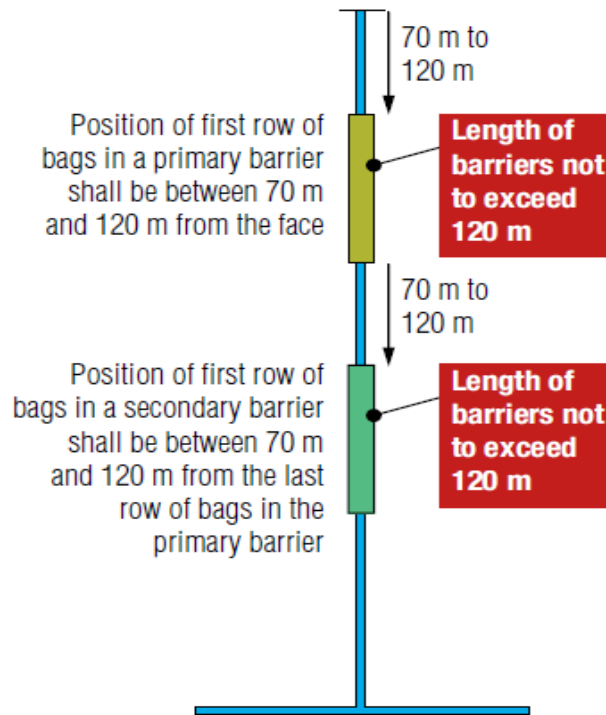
Typical Primary/Secondary Barrier Arrangement for Coal Heading [2]
